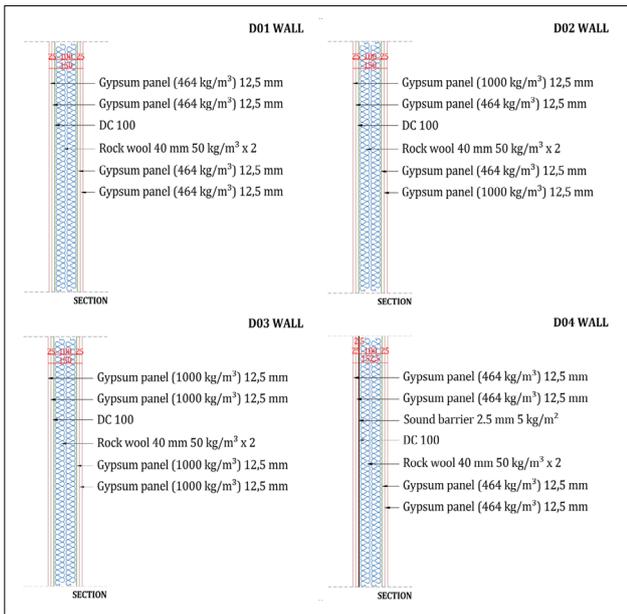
Single-Frame Gypsum Board Partition Wall Systems Manufactured at TSE (Credit to authors).
